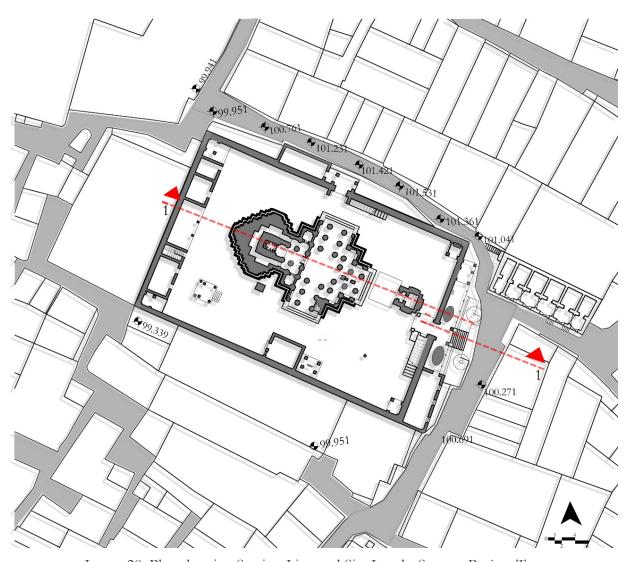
Plan showing Section Line and Site Levels, Source: Project Team
